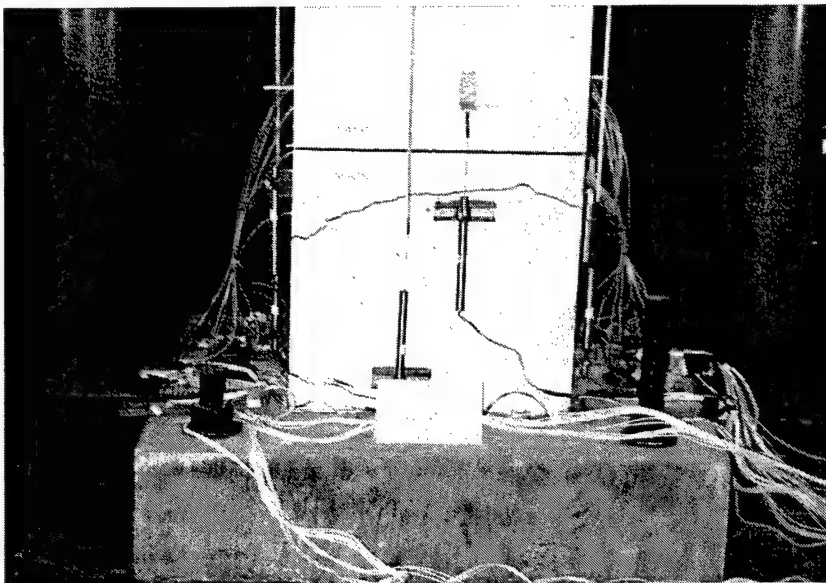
North view of 5SLCH failure plane showing multiple cracks
